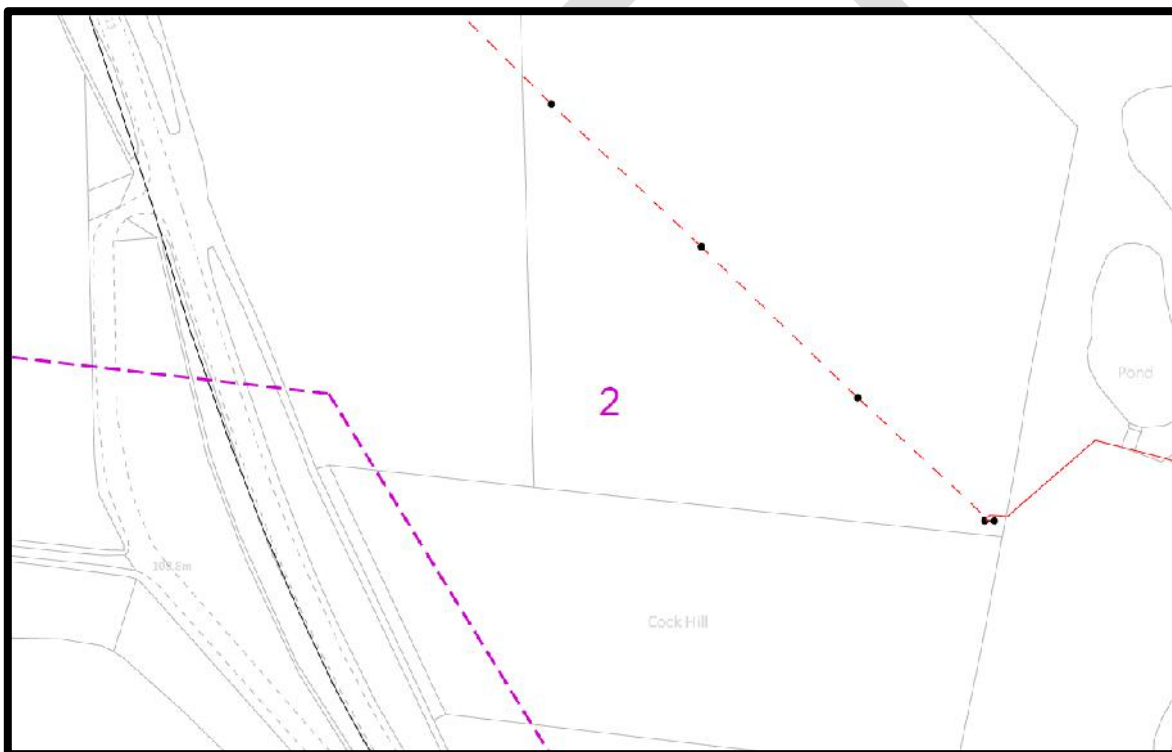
Extract from SPEN Services plans – cables noted on other side of A713 Road
